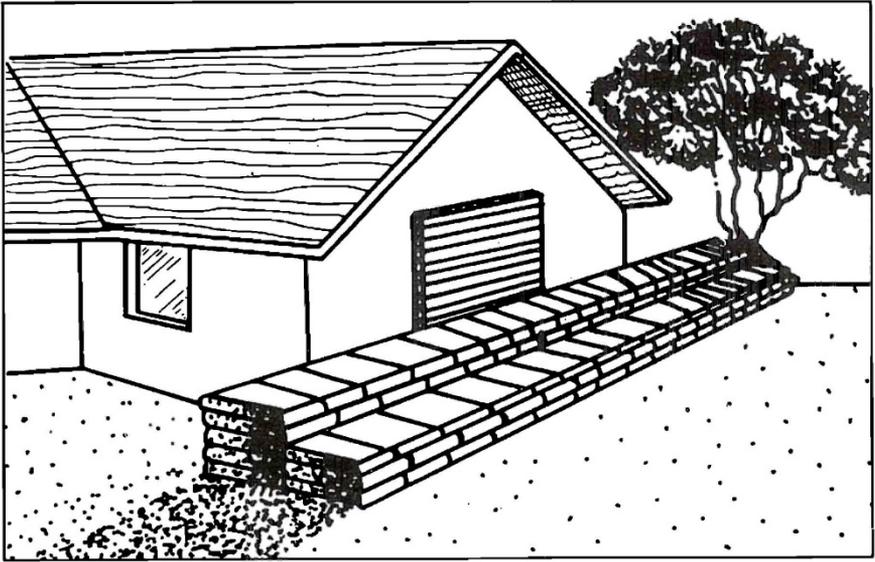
SANDBAG STACKING AGAINST BUILDINGS
